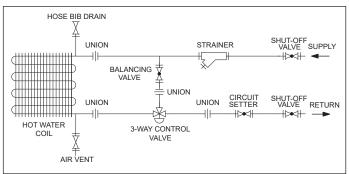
Typical 3-Way Piping Installation (piping and components by others)
